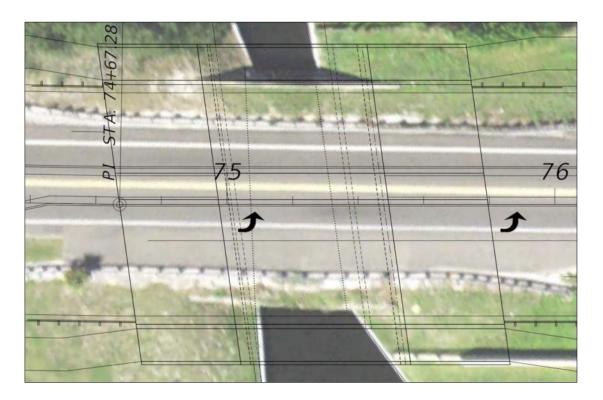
SR 544 Culvert at Conine-Smart Canal Bridge Length Schematic
